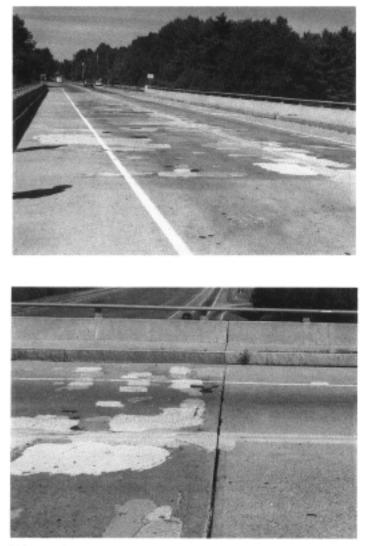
Patching of a severely contaminated concrete deck.
